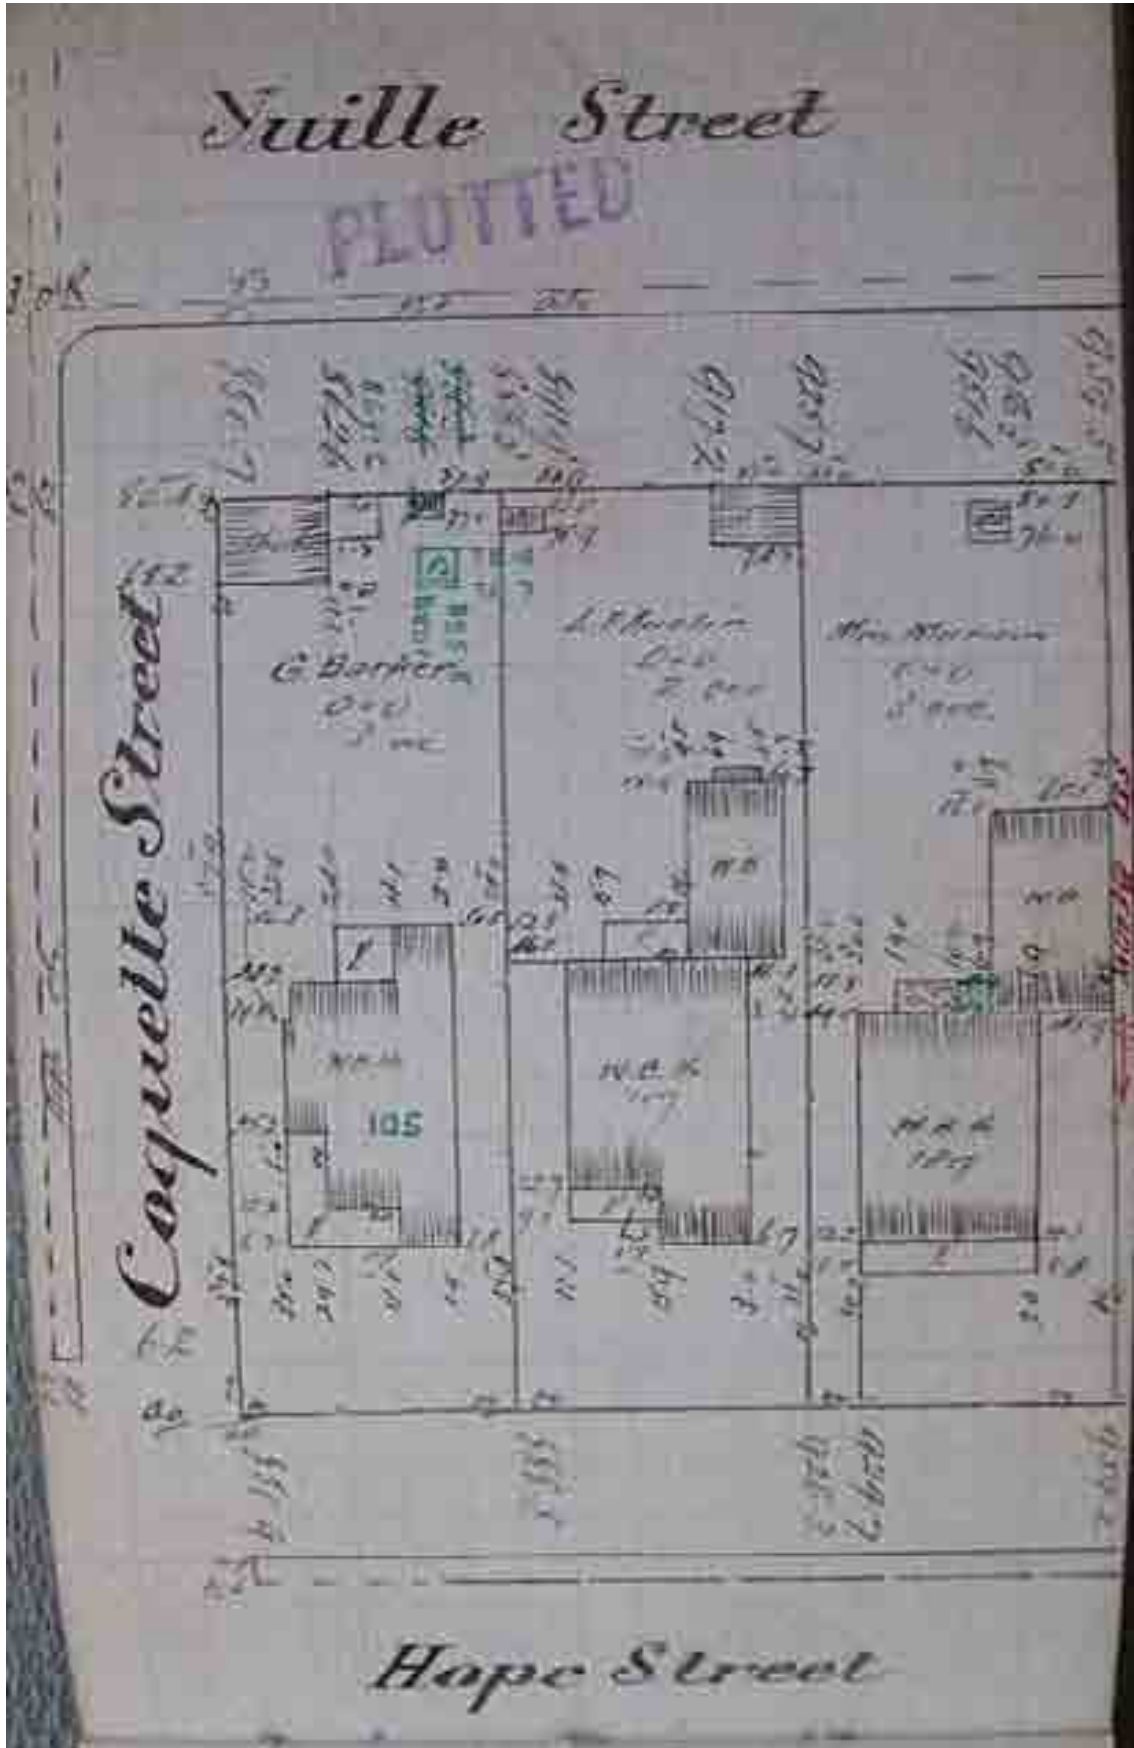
Geelong Waterworks & Sewerage Trust Fieldbook plan no. 148, p.16, c.1913, showing asphalt channels as broken lines. Source: Barwon Water collection.
